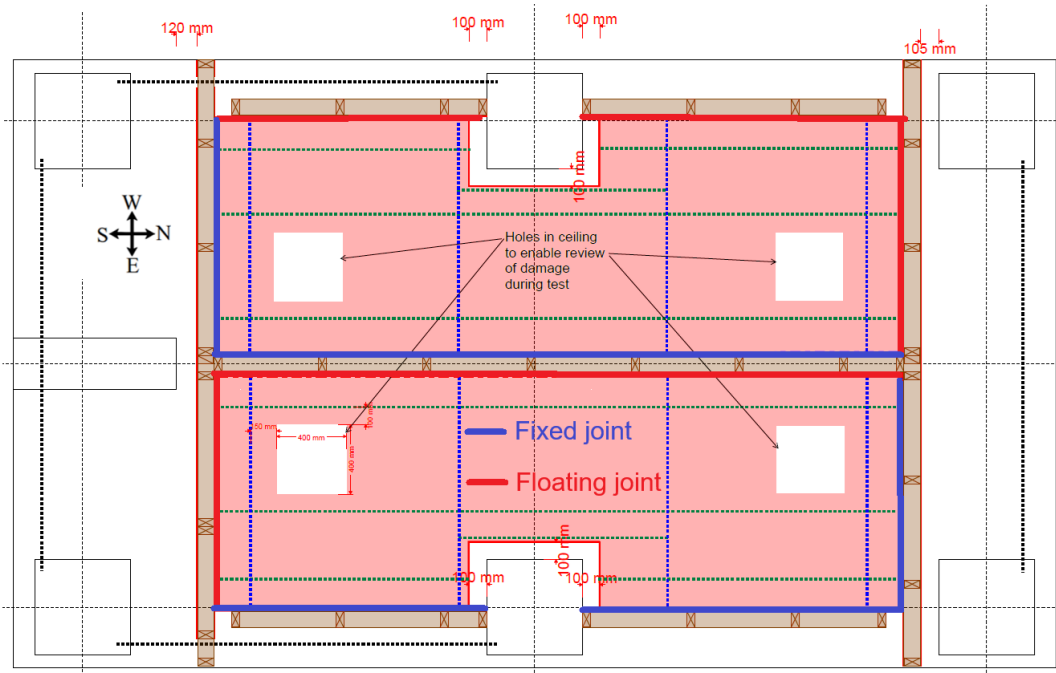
Area of ceiling installation with intended perimeter joint details (plan)
